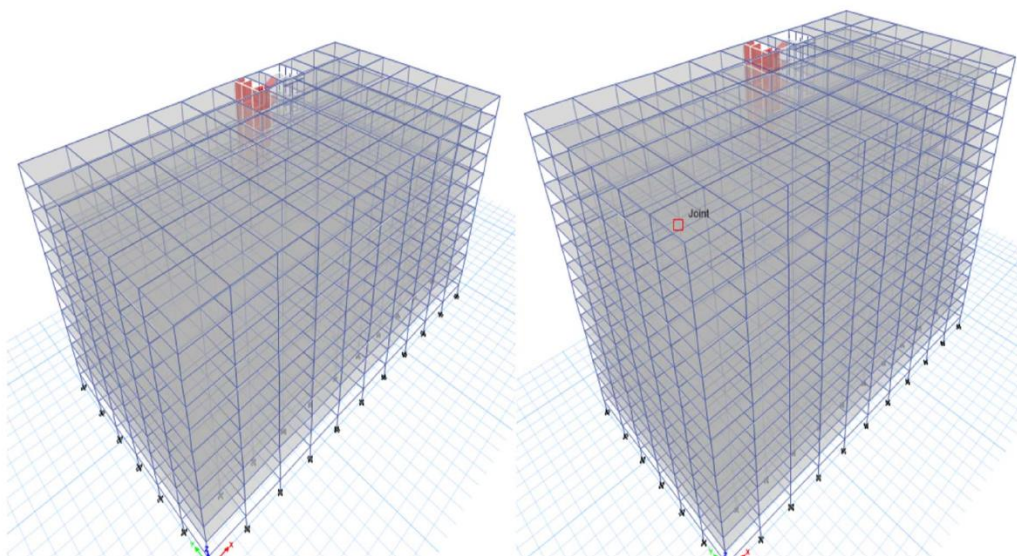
ETABS 3D model without expansion joint: (a) 10-storey building; (b) 15-storey building.
